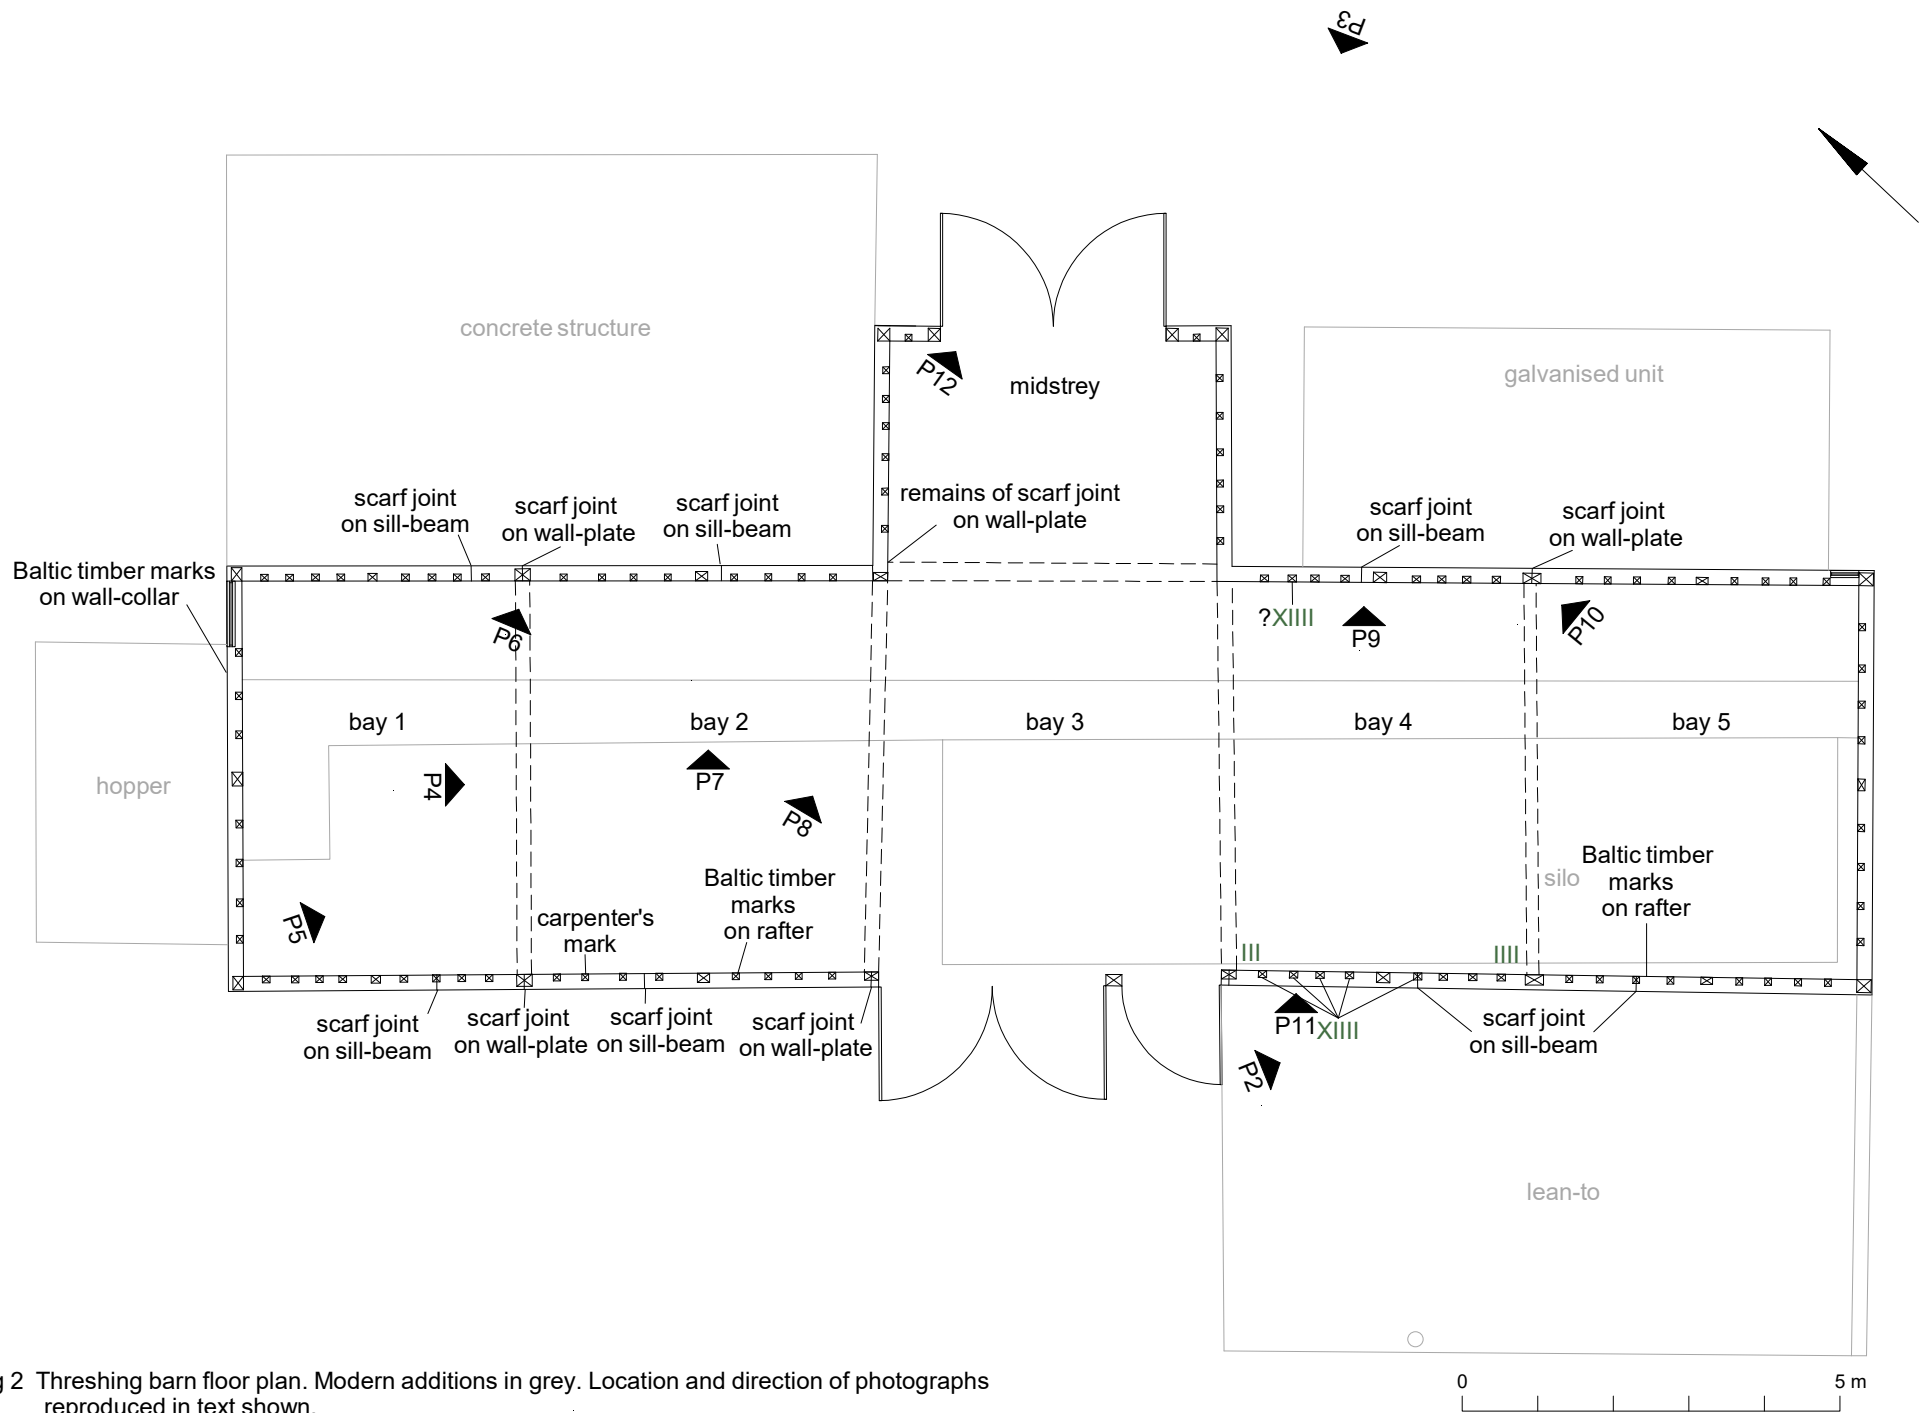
Threshing barn floor plan. Modern additions in grey. Location and direction of photographs reproduced in text shown.
